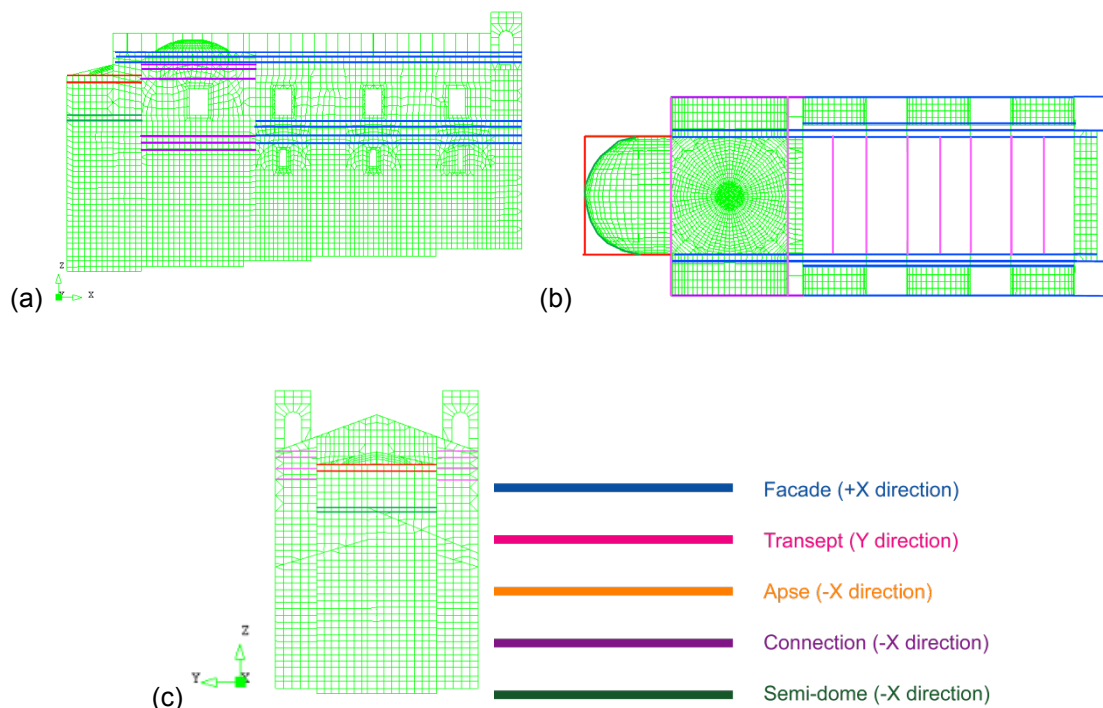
Tie locations in FEM model (a) north elevation (b) plan and (c) east elevation.
